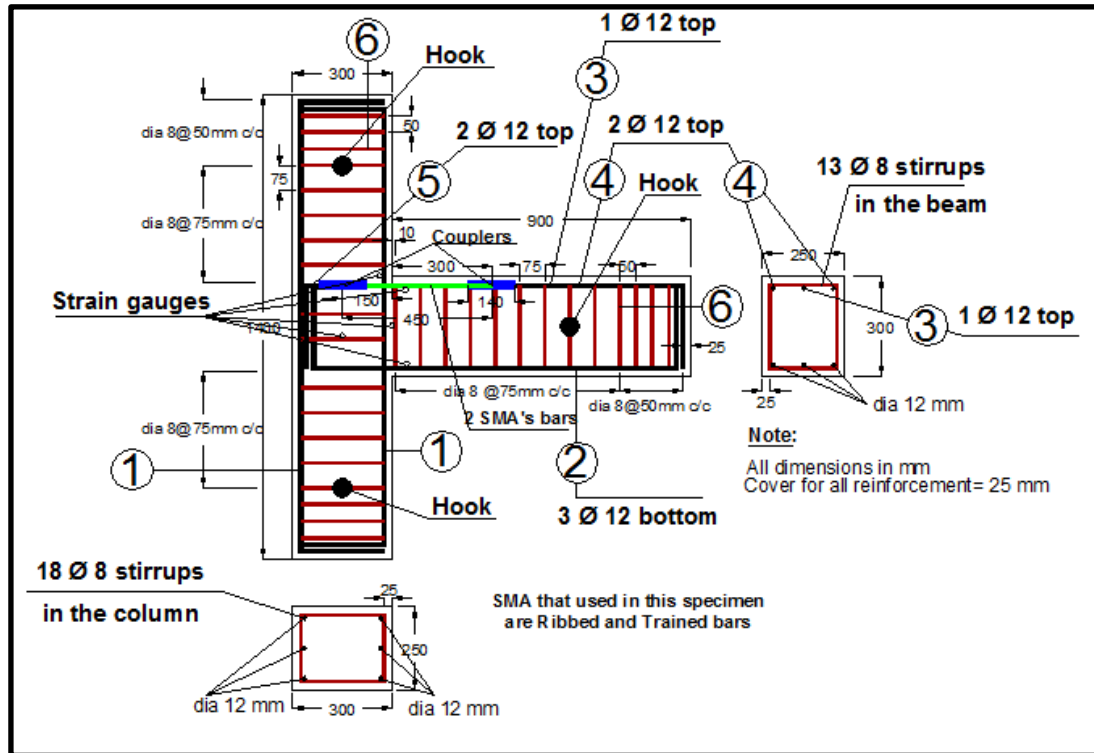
5: Geometry and reinforcement details of NiTi-BCJ-2 specimen
